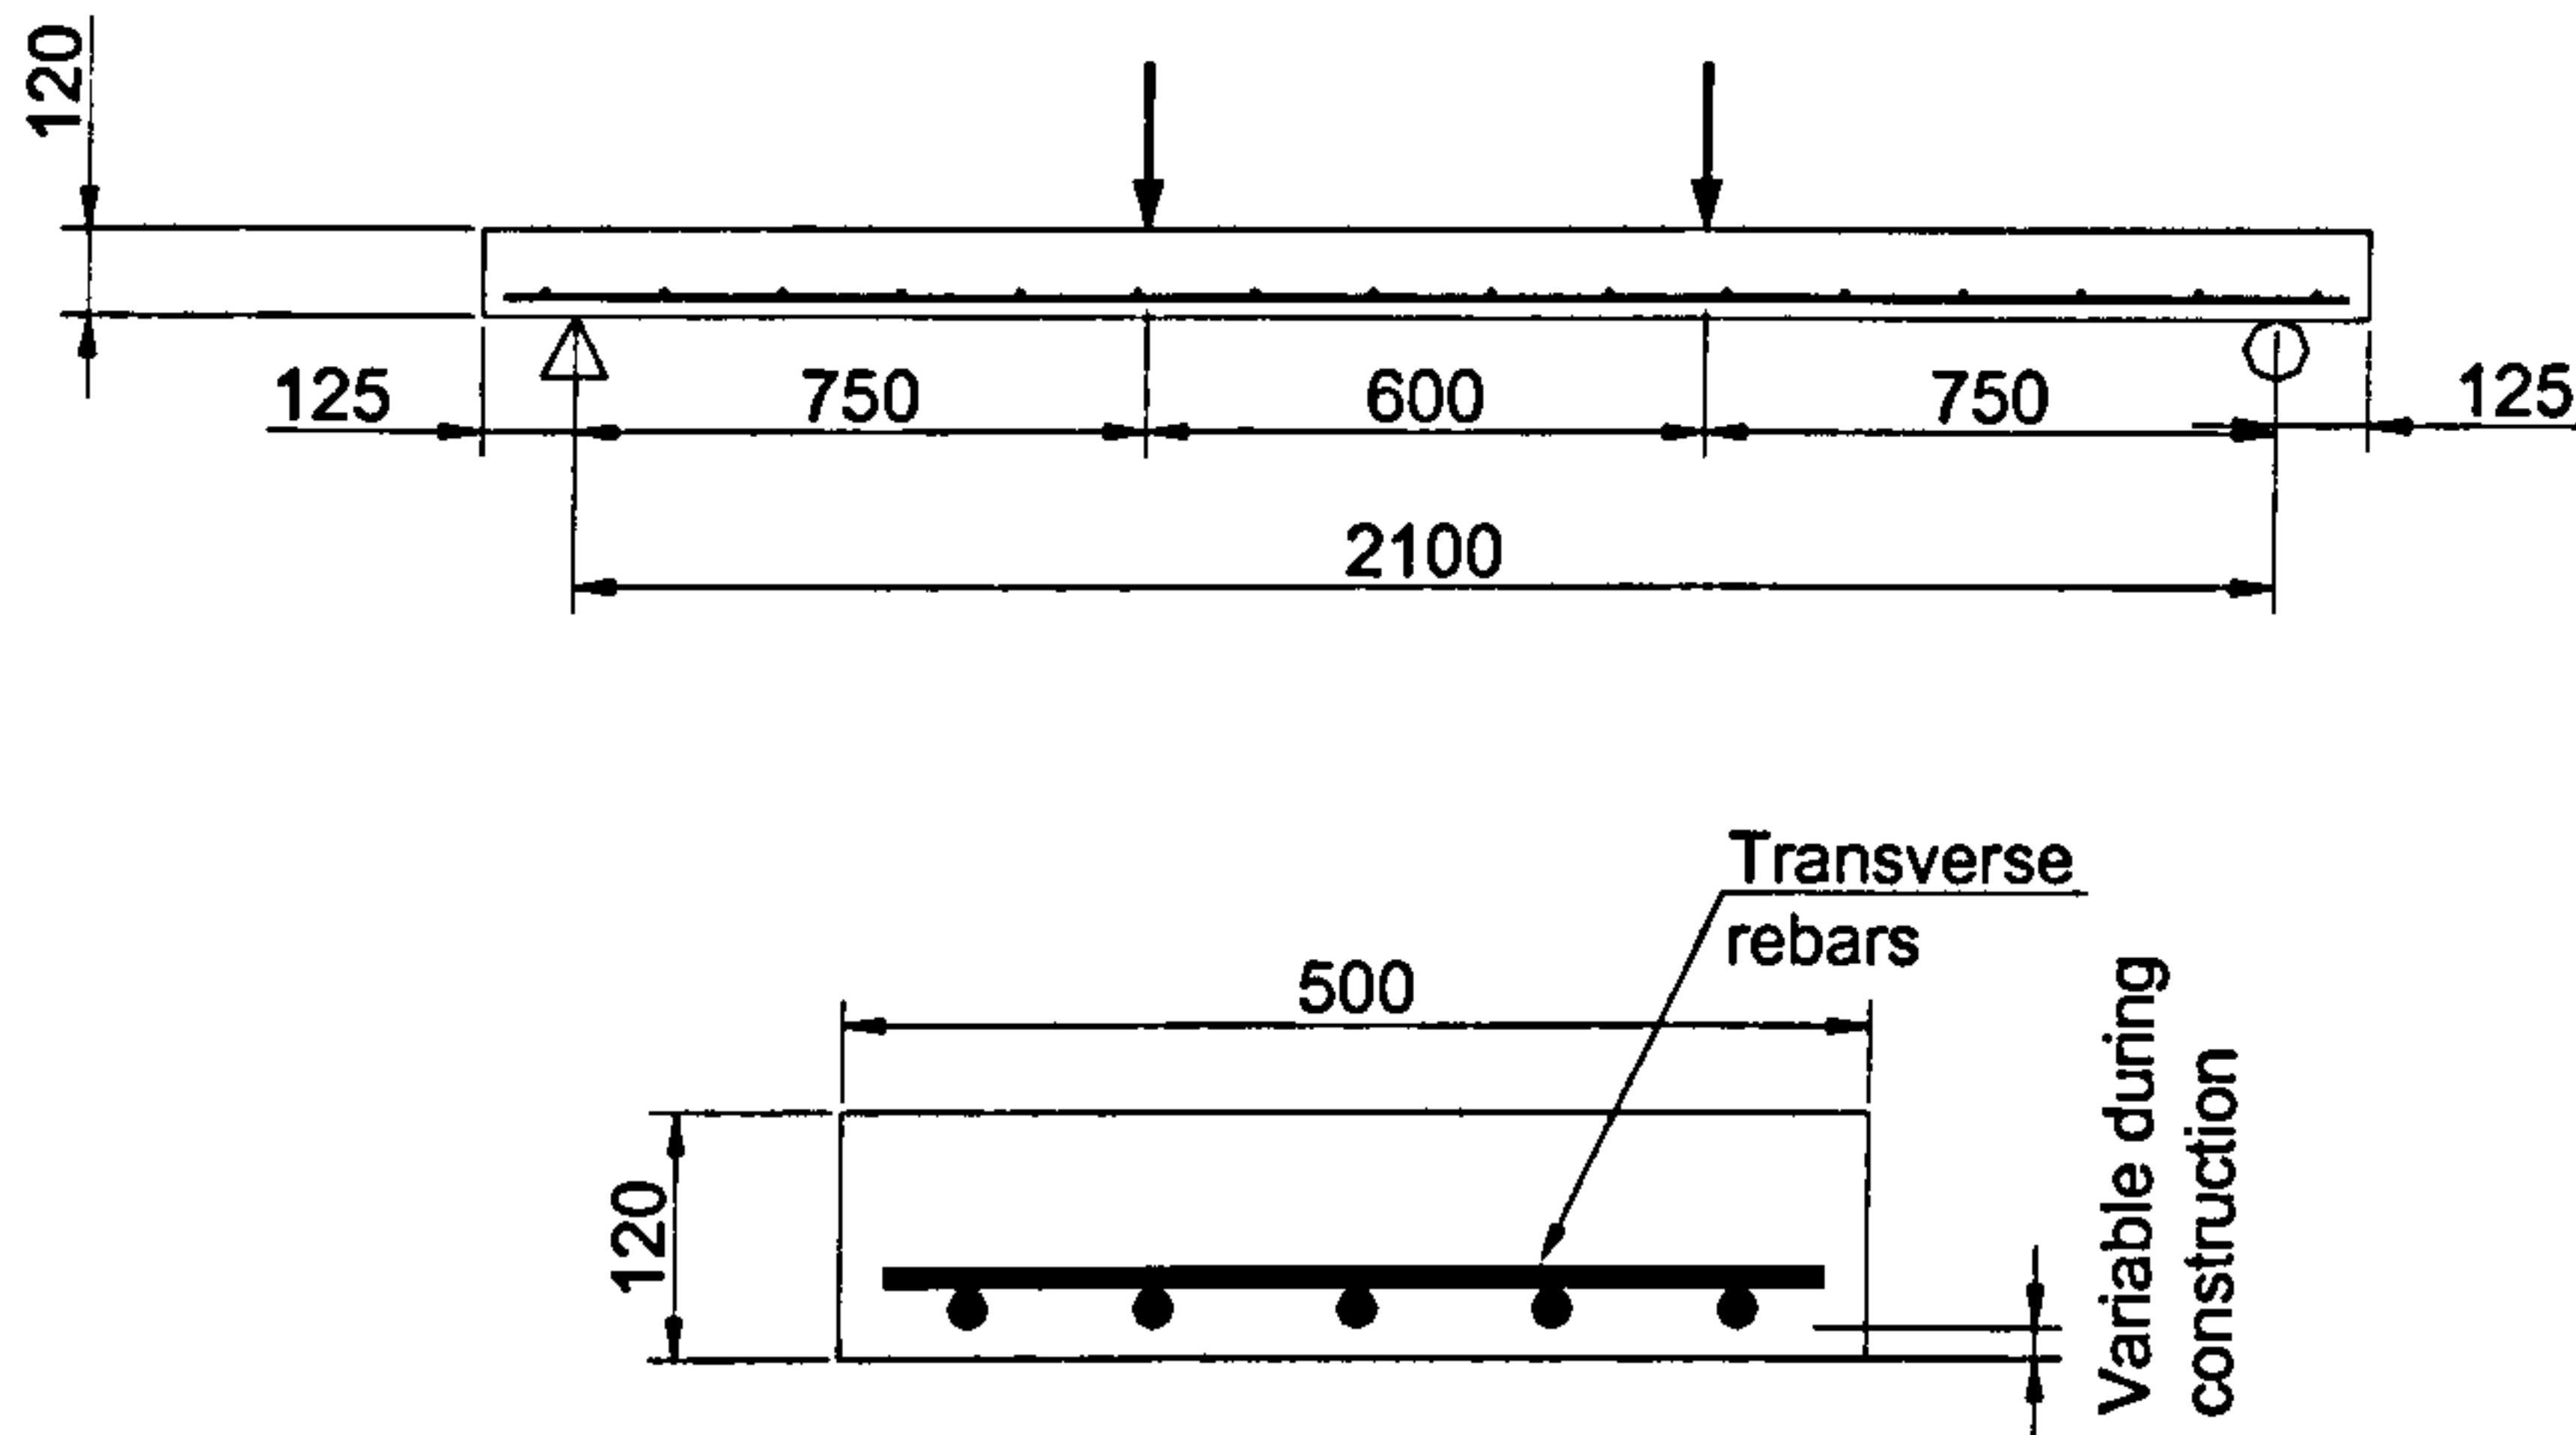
Typical loading details and reinforcement details of the slabs
